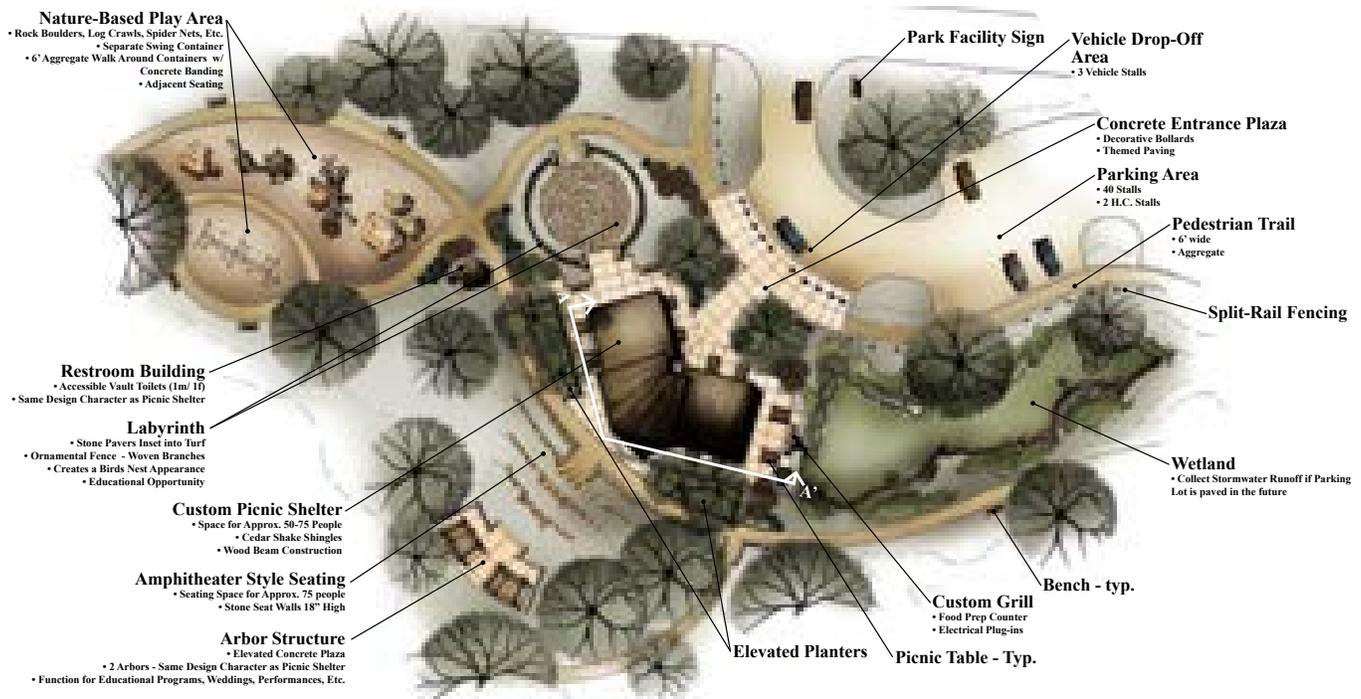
LAYOUT ENLARGEMENT PLAN OF THE MAIN PARK SUPPORT FACILITY AREA
